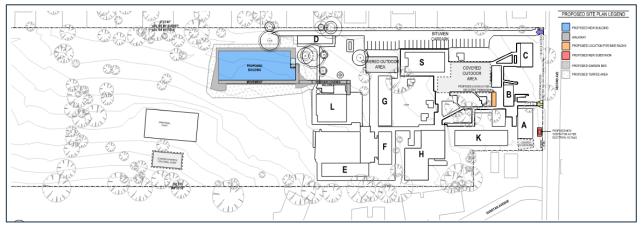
PROPOSED SITE PLAN REVISION 06
